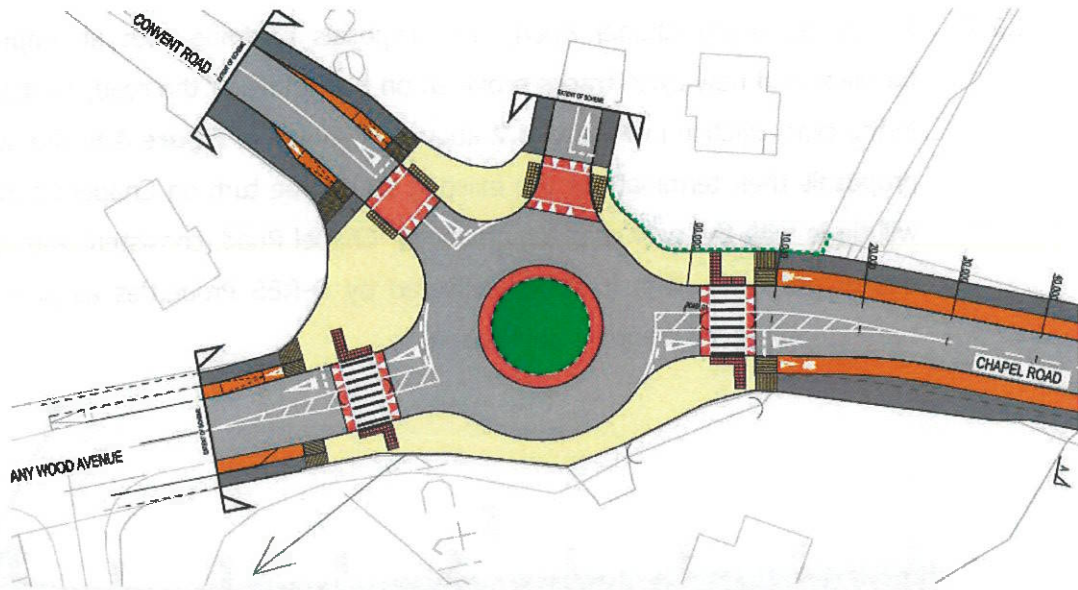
Section 1 Design Proposals for the Chapel Road/Convent Road Roundabout
